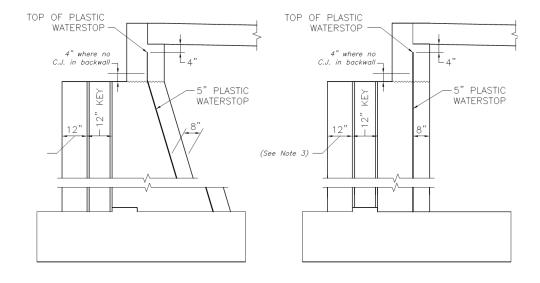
Waterstop through construction joint in gravity and cantilever abutments (similarly executed in wingwalls)
